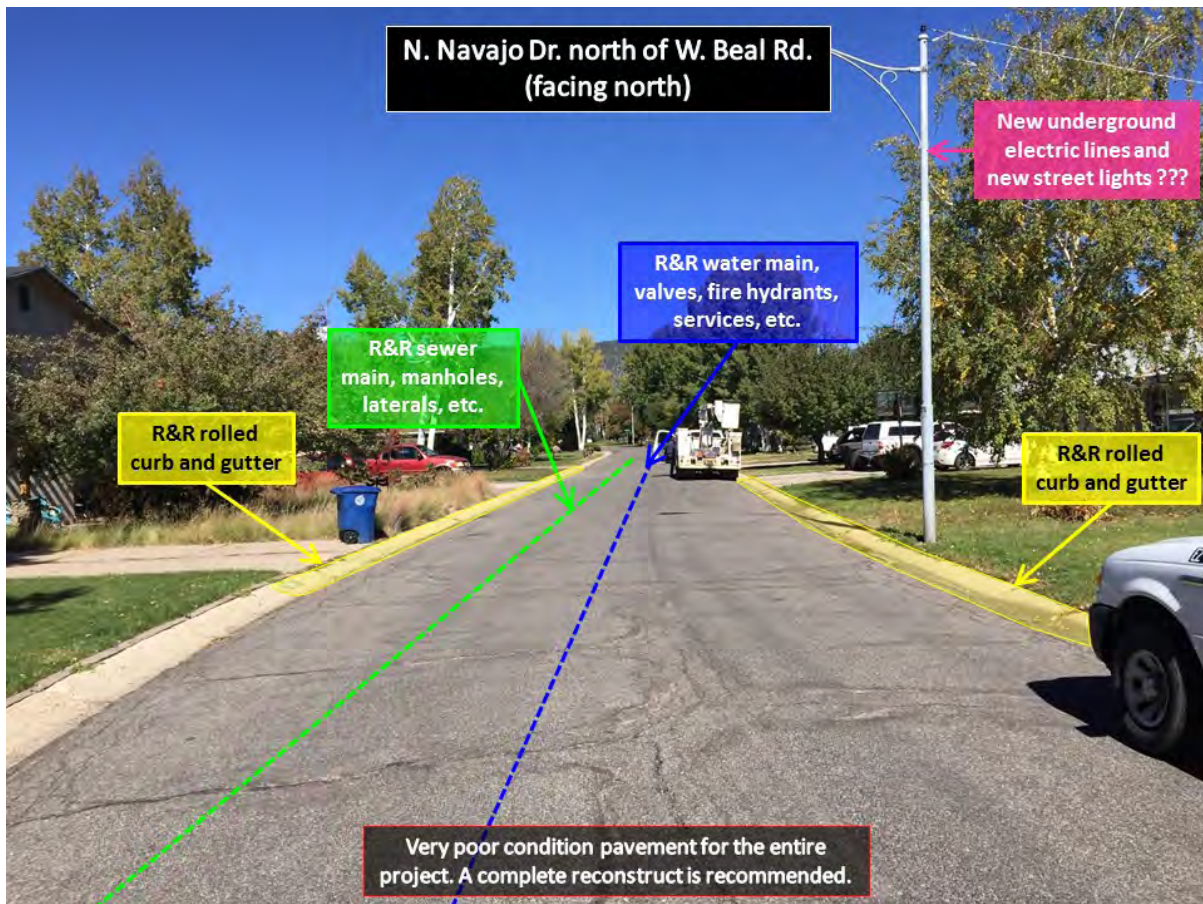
R&R water/sewer mains & appurtenances, pavement section, rolled curb and gutter, and street lights???
